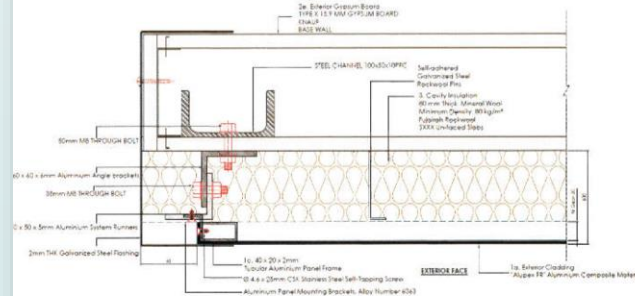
"Alupec FR" non-load-bearing exterior wall cladding window side flashing details
